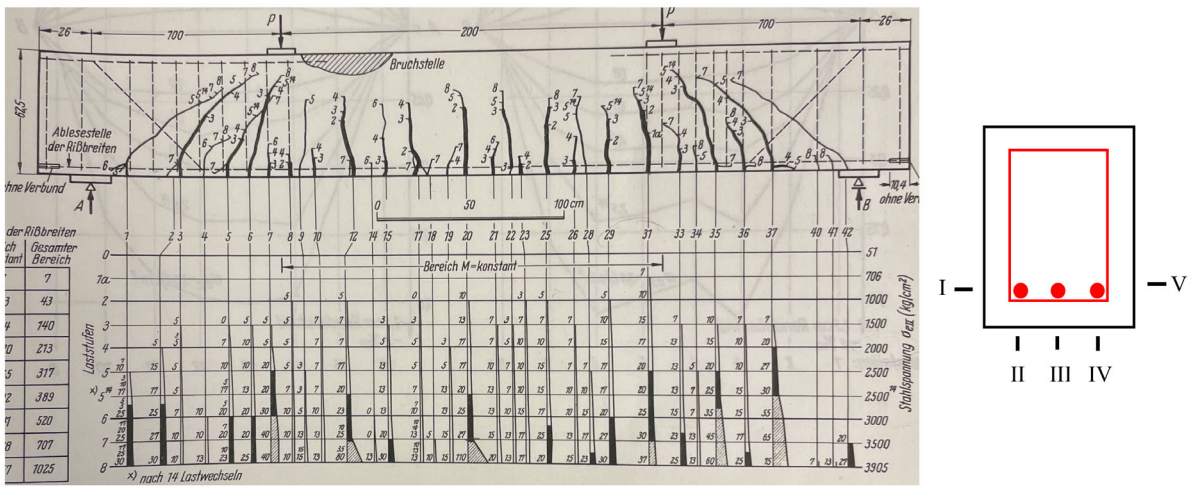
Crack widths for R-69 (in 1/100 mm) with corresponding load intensity on one side of the beam with the crack width reading at point V.
